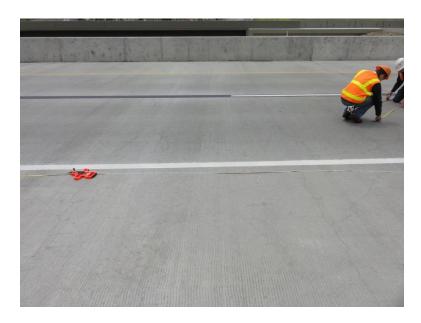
Reflection cracking from half-deck concrete panels in 8200 South northbound conventional concrete deck at 1 year.
